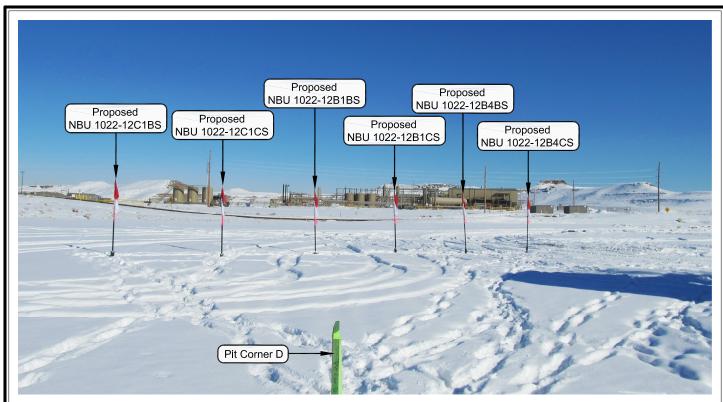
PHOTO VIEW: FROM PIT CORNER D TO LOCATION STAKE
